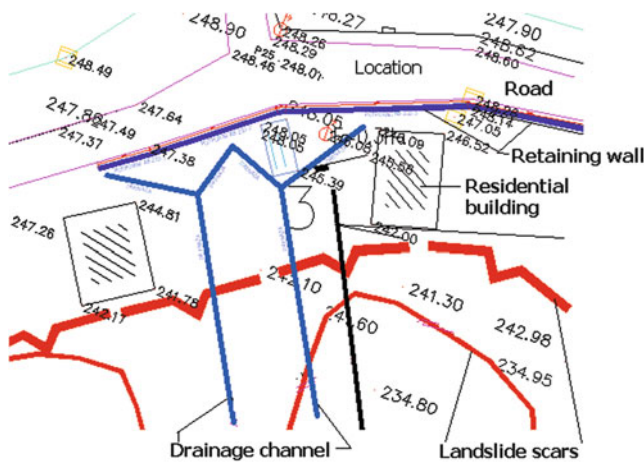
Landslide situation with the position of retaining wall and drainage channels
